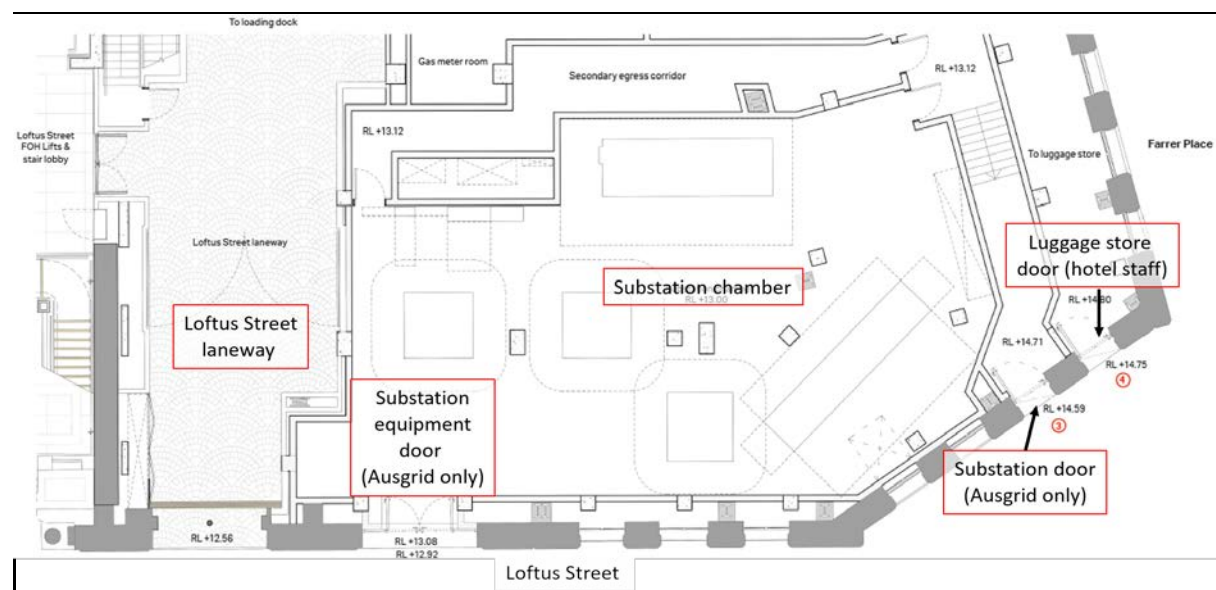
| Proposed substation chamber, lower ground level (Source: MOD 7 Design Report)
